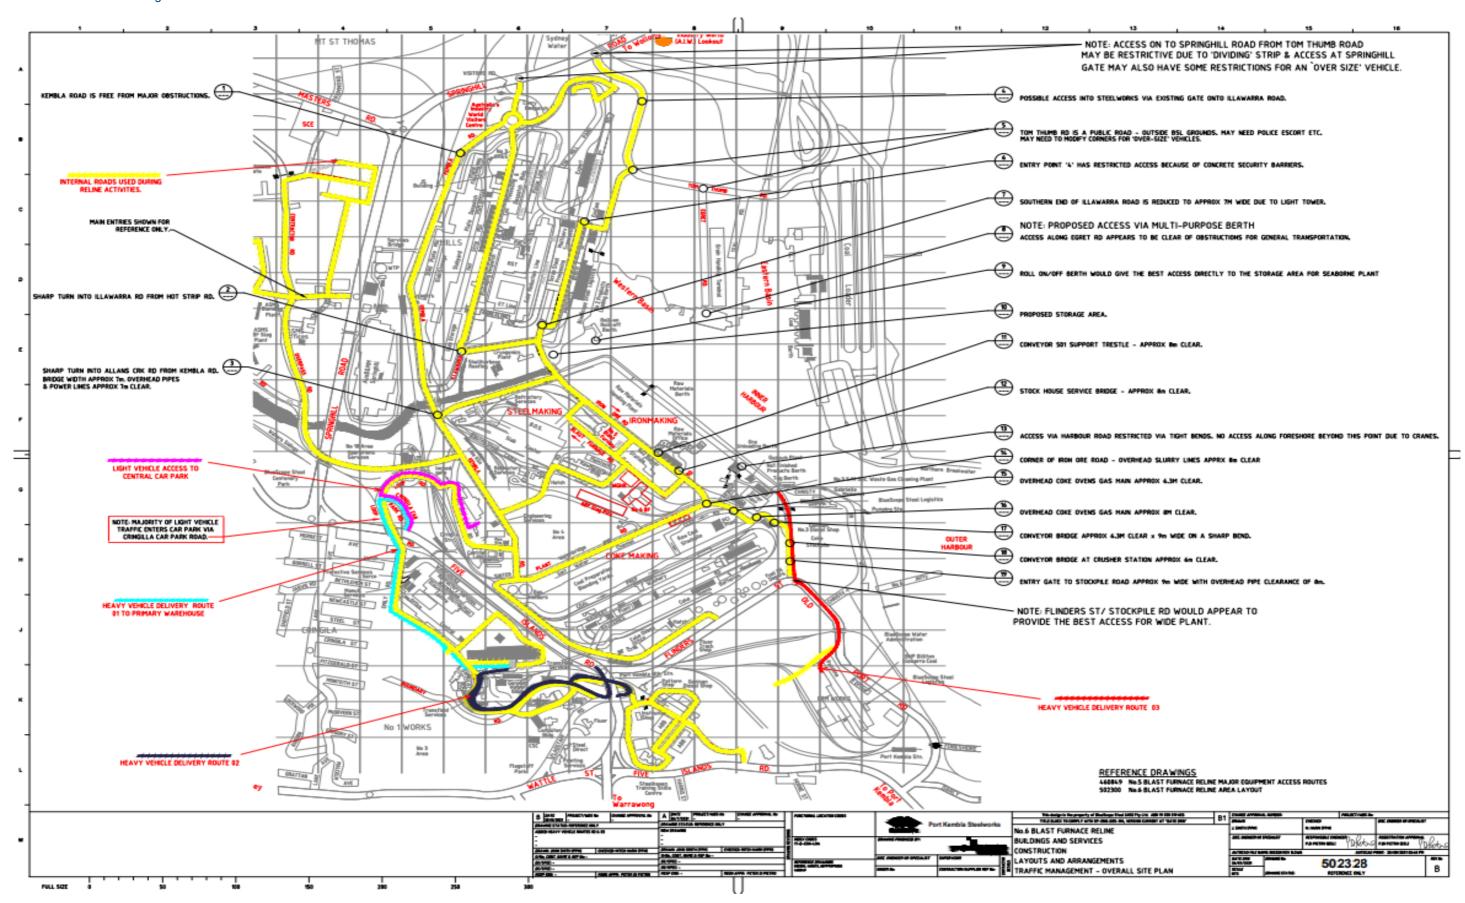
Schematic of Potential Road Routes considered as Access Points within the Works, and Limitations of Existing Road Network
